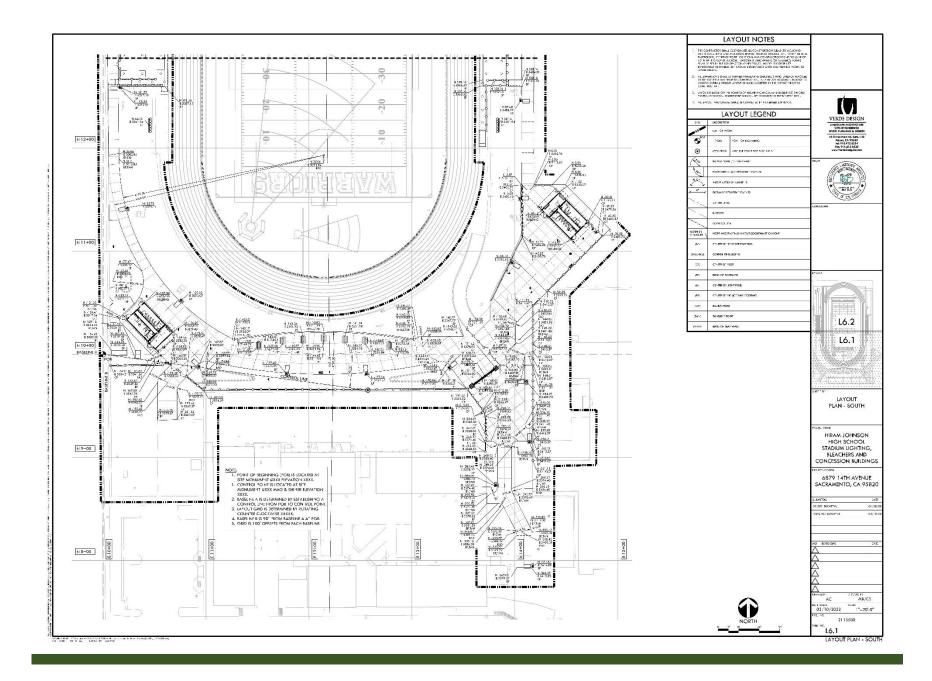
SOUTH PORTION OF STADIUM IMPROVEMENT PLANS
